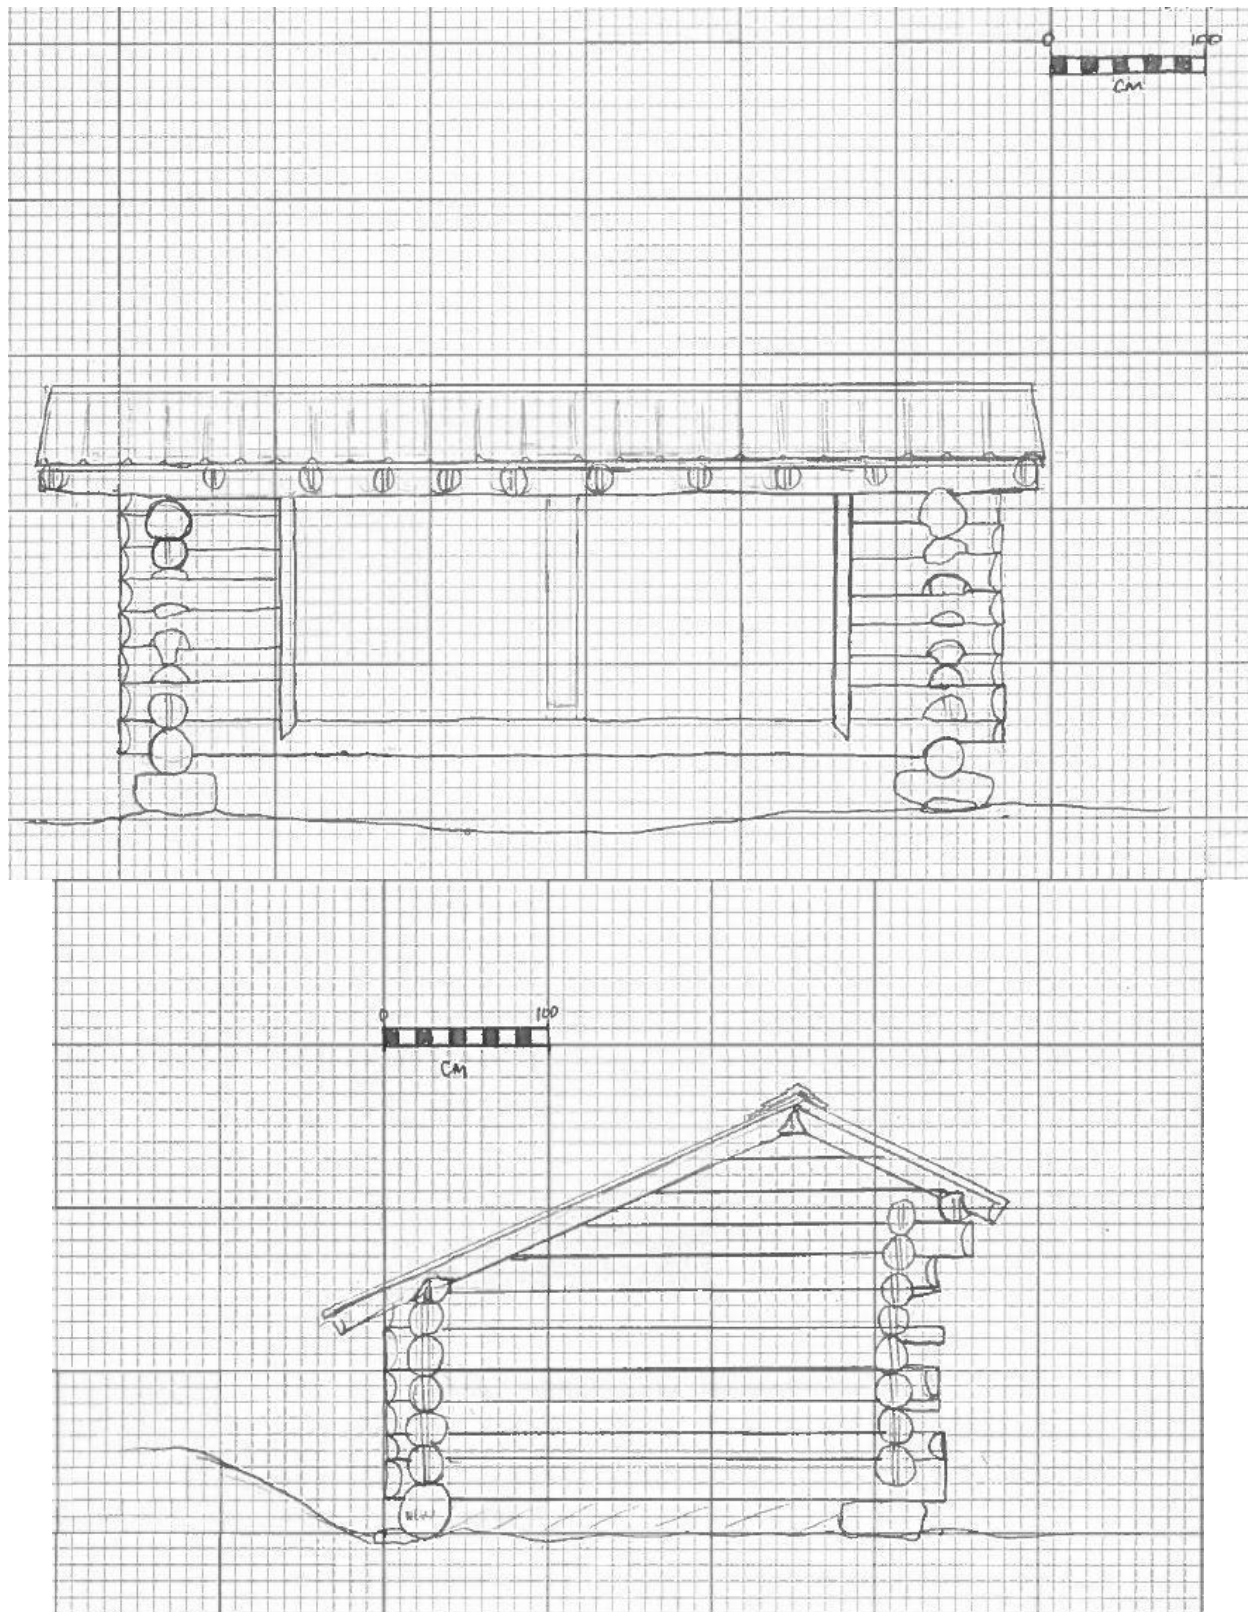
Sawyer Pond shelter drawings. Above: East (front) elevation. Below: South side elevation. November 9, 2011.
